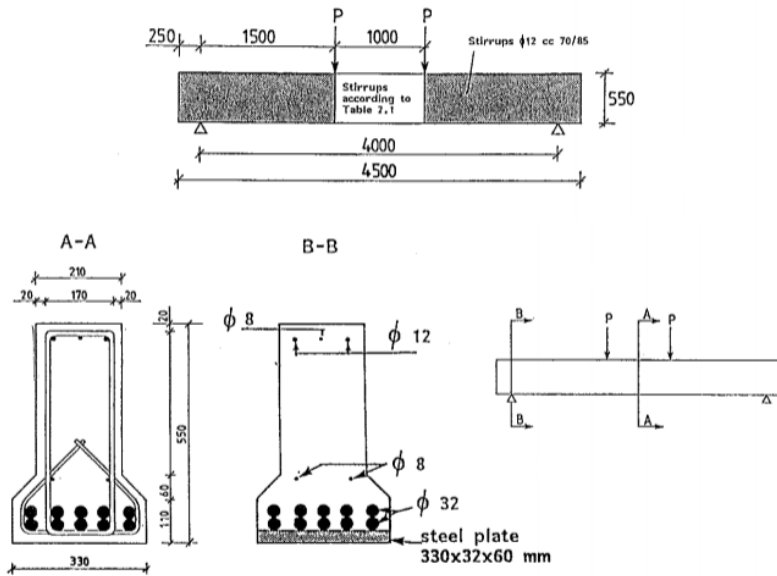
Geometry of the overreinforced beams with view of cross section at the mid-section and at the support
